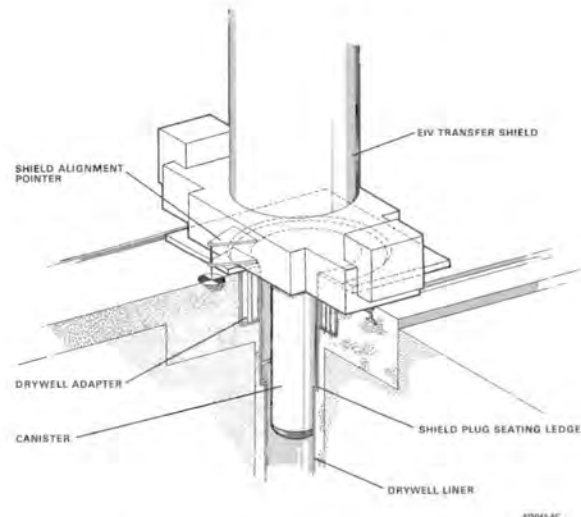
Transfer Shield, Drywell Adapter and Drywell Arrangement During Canister Emplacement
